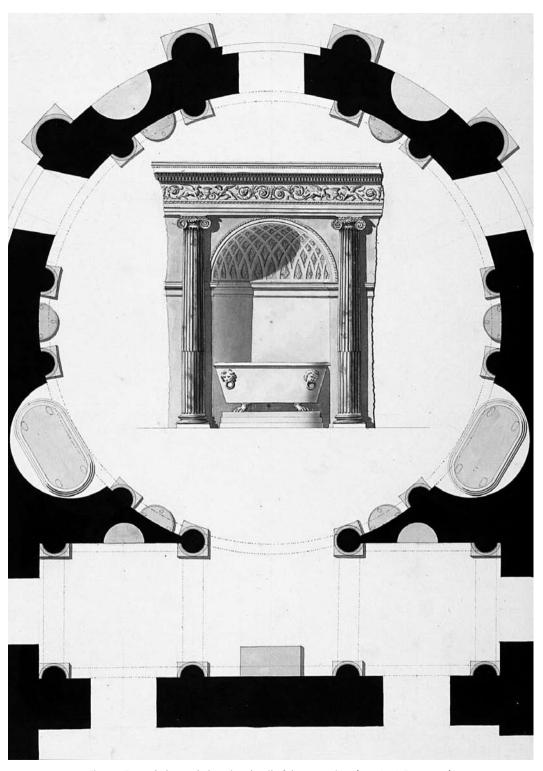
Ground plan and elevation detail of the unctorium (WAF 67, J. Rys. 5.011)
